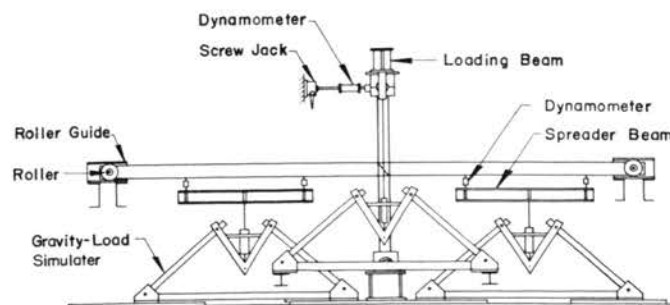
Schematic sketch of test setup for test specimen RC-2
